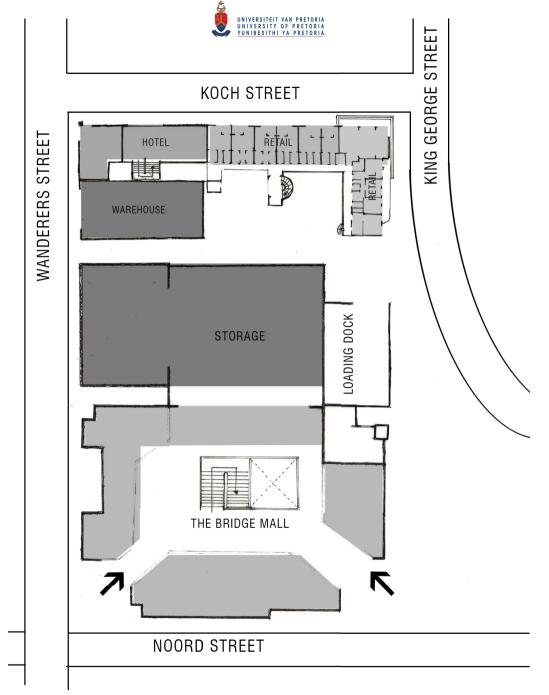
THE GROUND FLOOR LAYOUT
